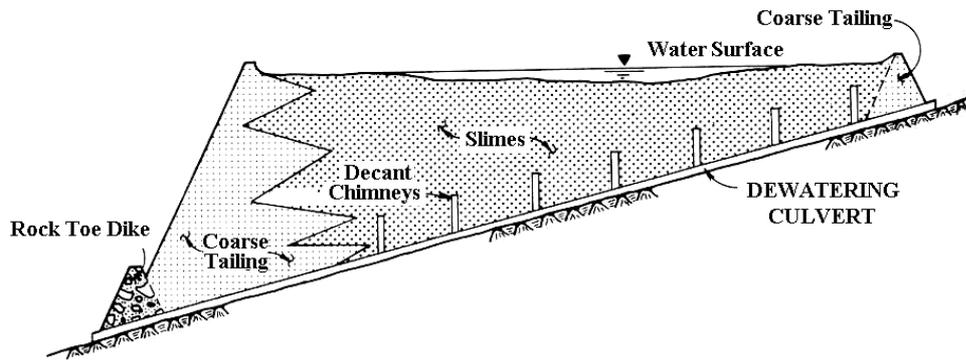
Cross-section of the reinforced concrete culvert in tailings dam (Smith and Connell, 1979)
